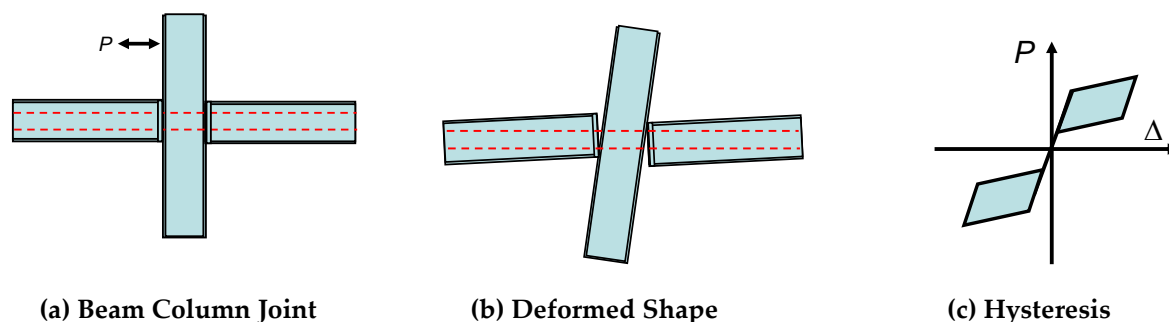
Post-tensioned beam deformation and hysteretic behaviour (MacRae, 2010).
